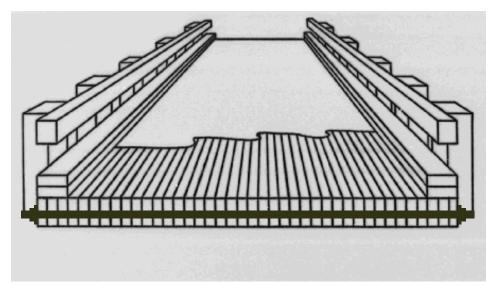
Typical Section of a Stress-Laminated Timber Slab Bridge
